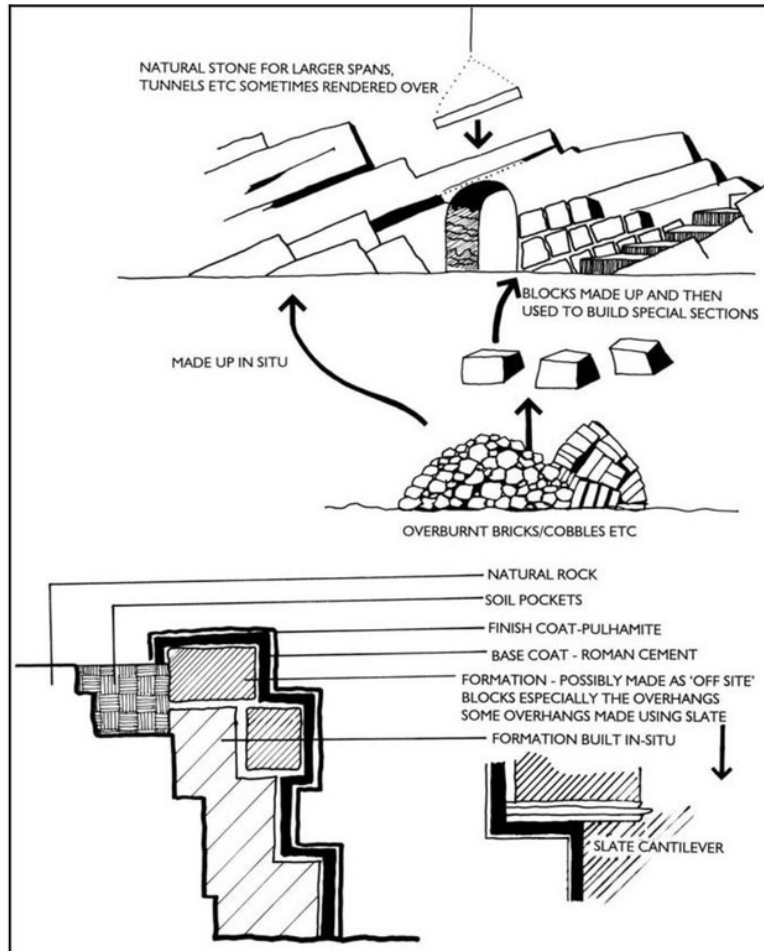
Details of construction at Ramsgate showing rockwork built in-situ and off-site.
